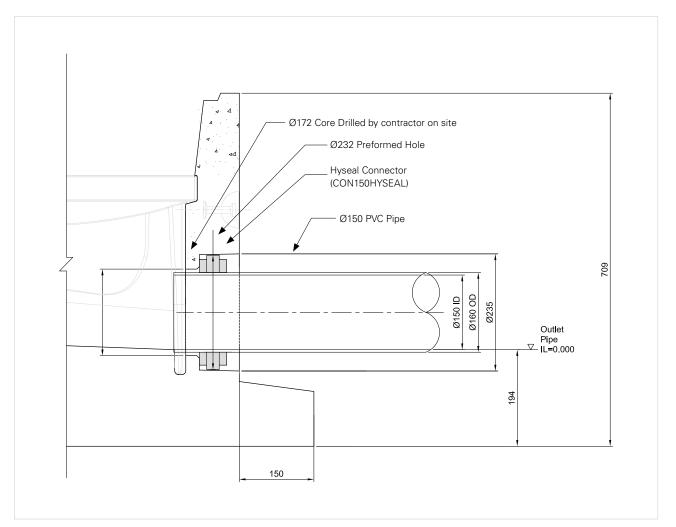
Outlet Pipe Connection Detail of Ø150mm Hybencher
